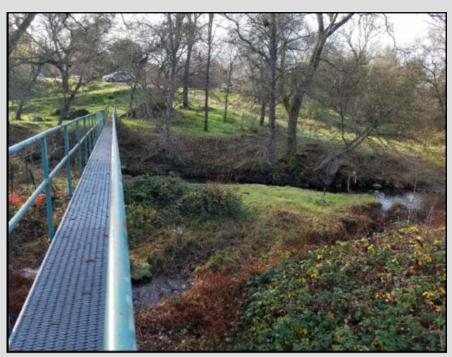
Standing on siphon, facing south. Both Doty Ravine and Sailors Ravine are visible.
